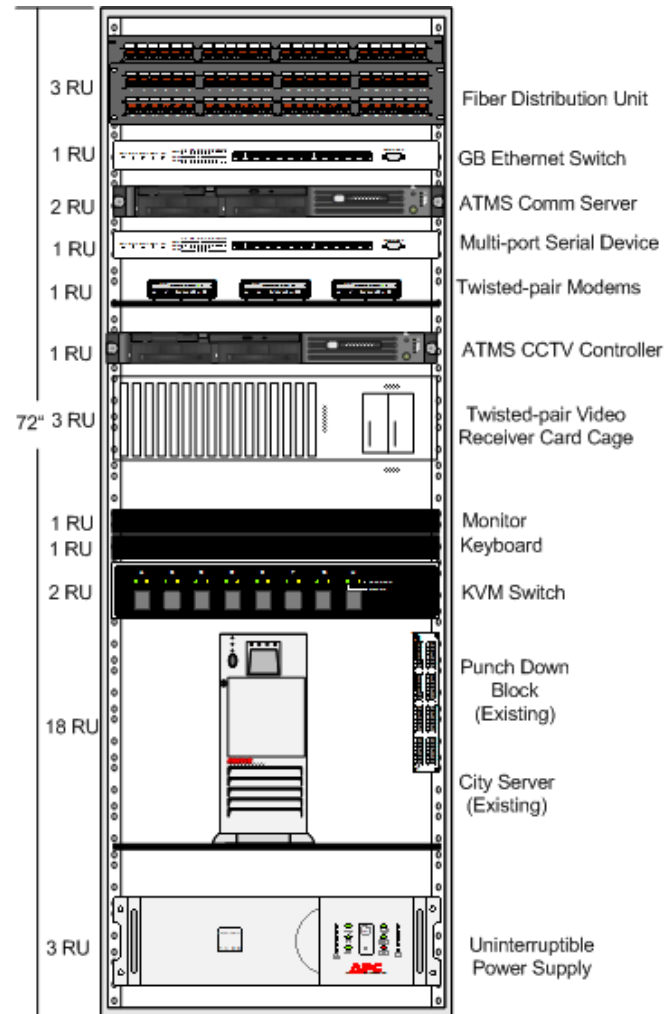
South Gate Secondary LCC Equipment Rack Elevation
